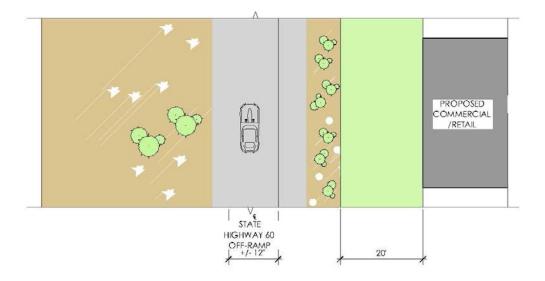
State Highway Off-ramp 60 Edge Plan J
